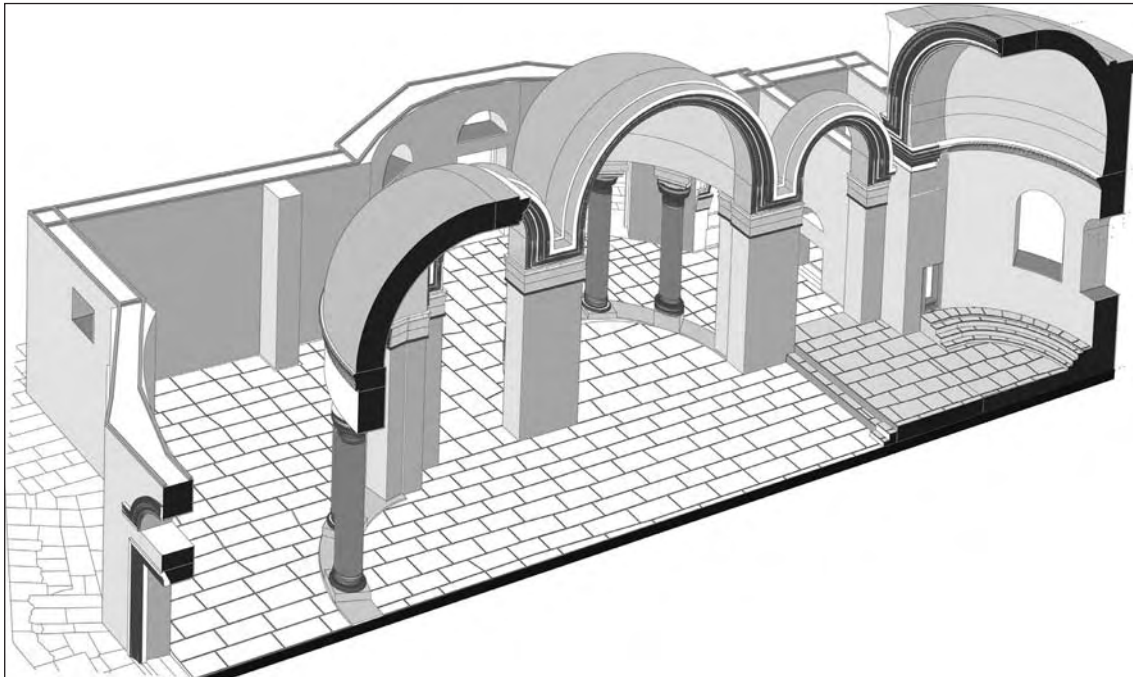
Resafa, Tetraconch Church, sectional perspective of the reconstructed exedras, arches and vaults, view to the north (I. Salman, 2010).
